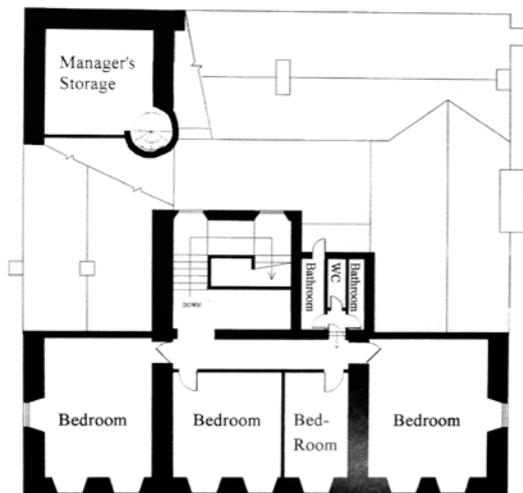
Second floor plan (CAC(W) DH/522/2 c1996)
